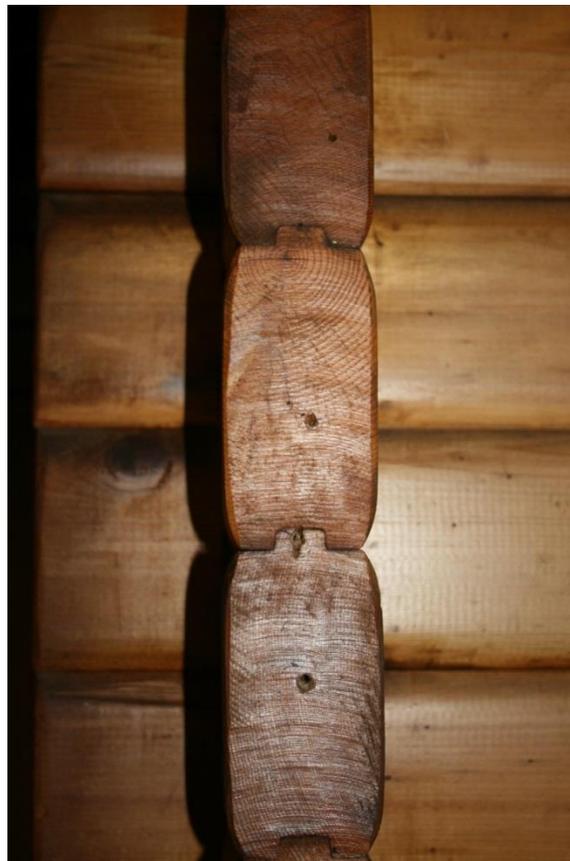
Cabin 3 typical interior and exterior wall construction for “Pan Abode” log walls. Typically tongue and groove log is net 2-3/4 inches wide by 5-1/2 inches high.
